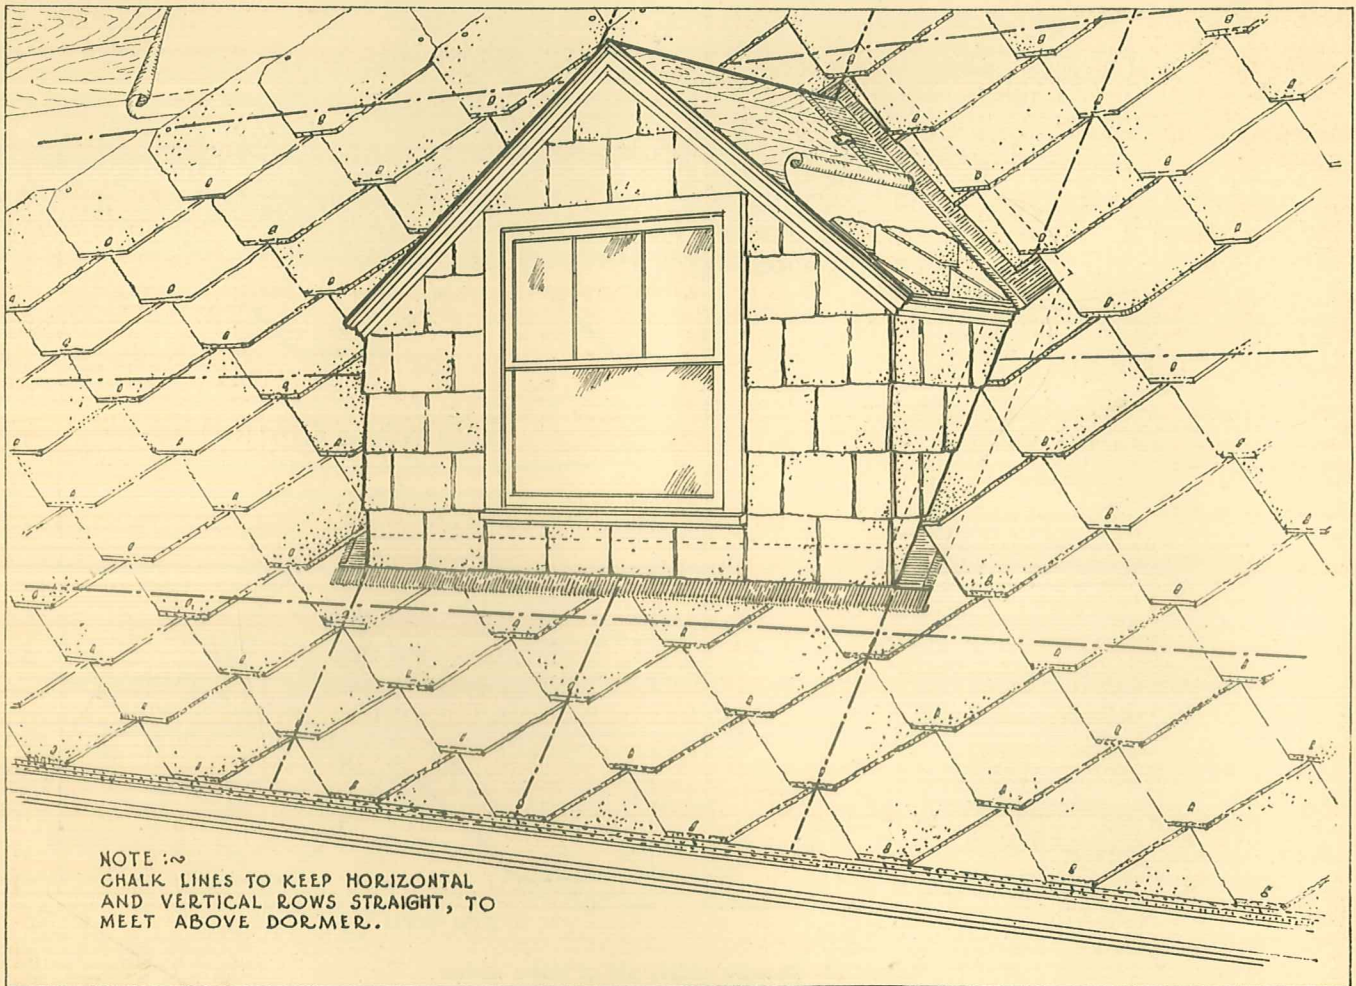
Shingling around the dormer—showing use of vertical and horizontal snap lines
